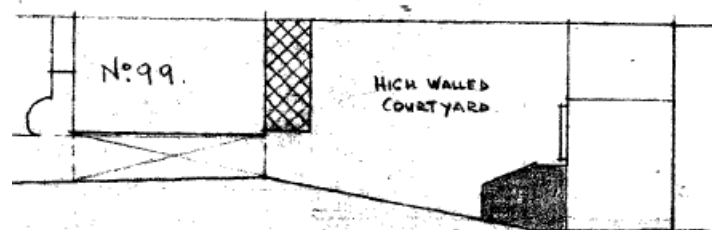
Site plan in 1975, depicting full-width glasshouse adjacent to the rear elevation.
